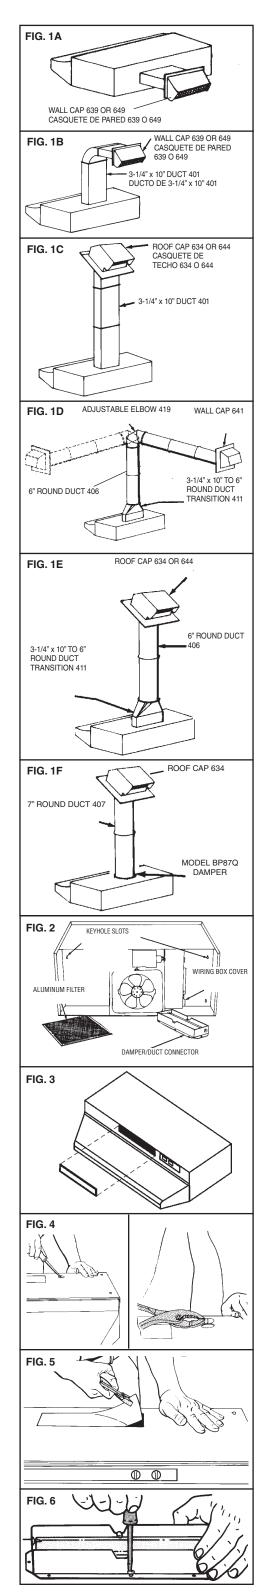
C. Ducting straight up through the roof using 3-1/4" x 10" rectangular duct. (For single story installations.)
